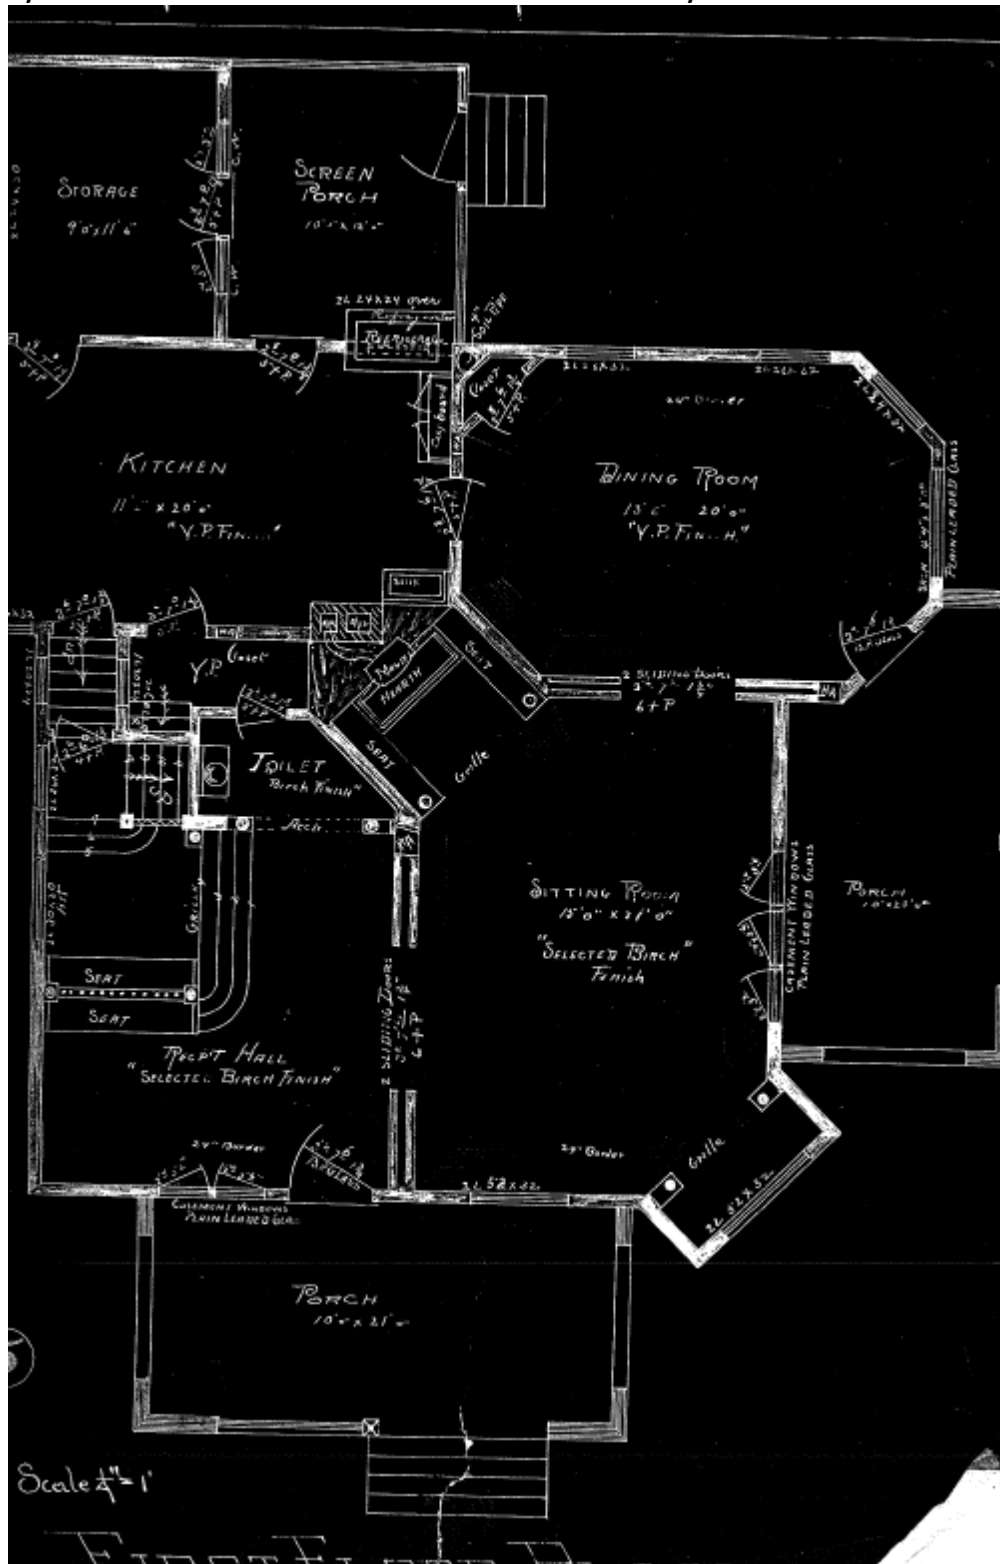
First Floor Plan, Moses N. Bair, 1904.
